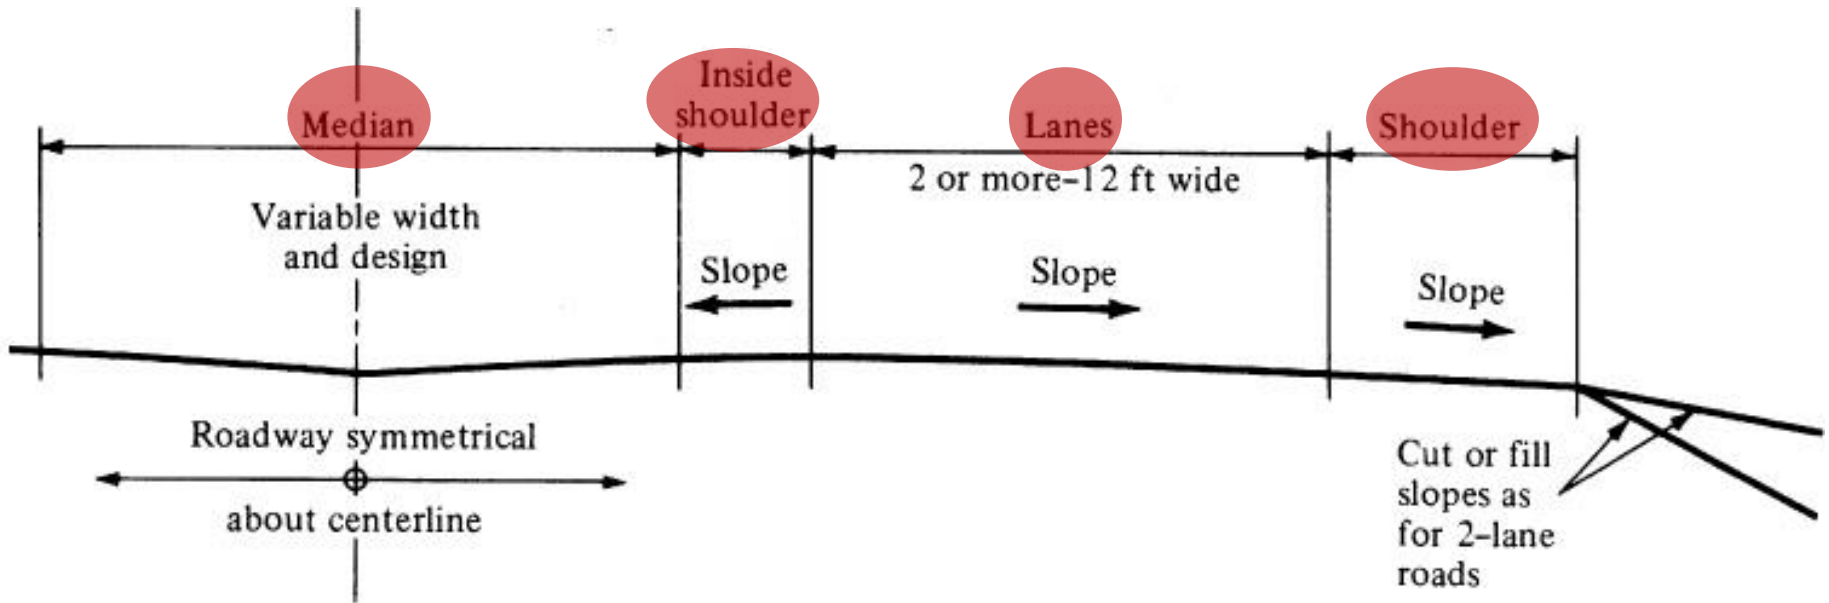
Typical Cross Section for Multilane Highways (half section)
